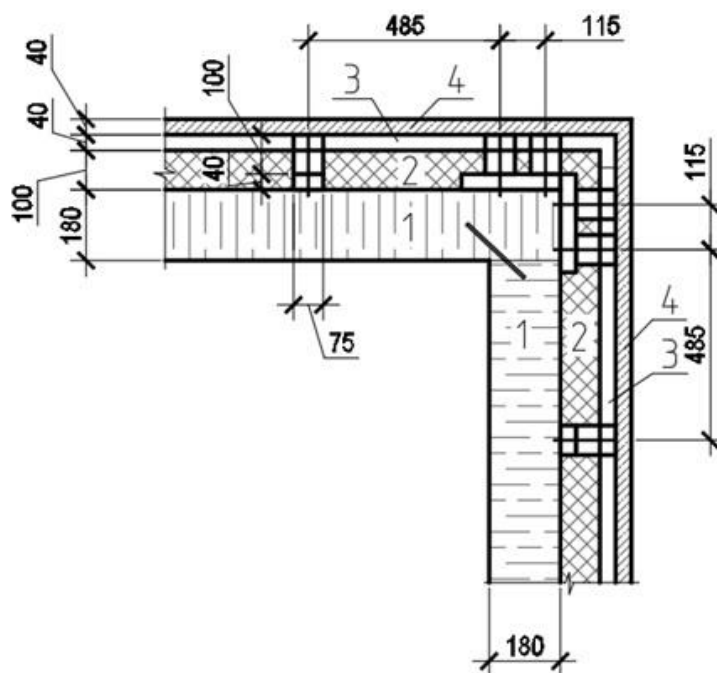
The investigated node – a wooden enclosing structure: 1 – timber layer 180x180 mm; 2 – insulation; 3 – vertical air layer; 4 – cladding layer
